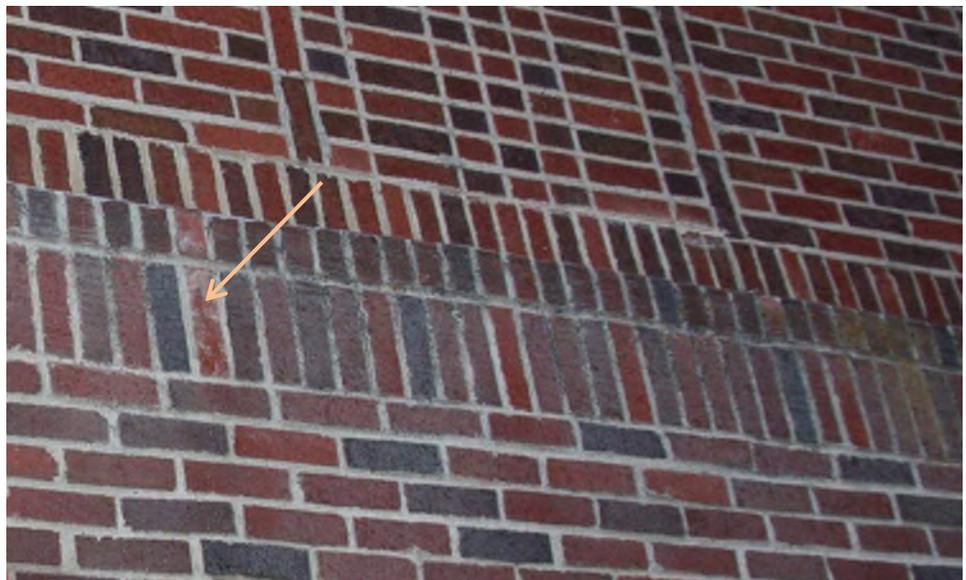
Soldier brick on the west face of the building has spalled (see arrow tip).
